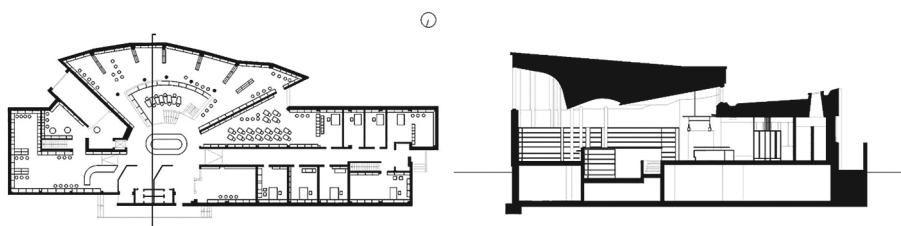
Seinäjoki Library (1965) Ground floor plan with section through the reading room (source: <http://arqbibliotecas.blogspot.com/2010/11/biblioteca-en-el-centro-civico-de.html>)
